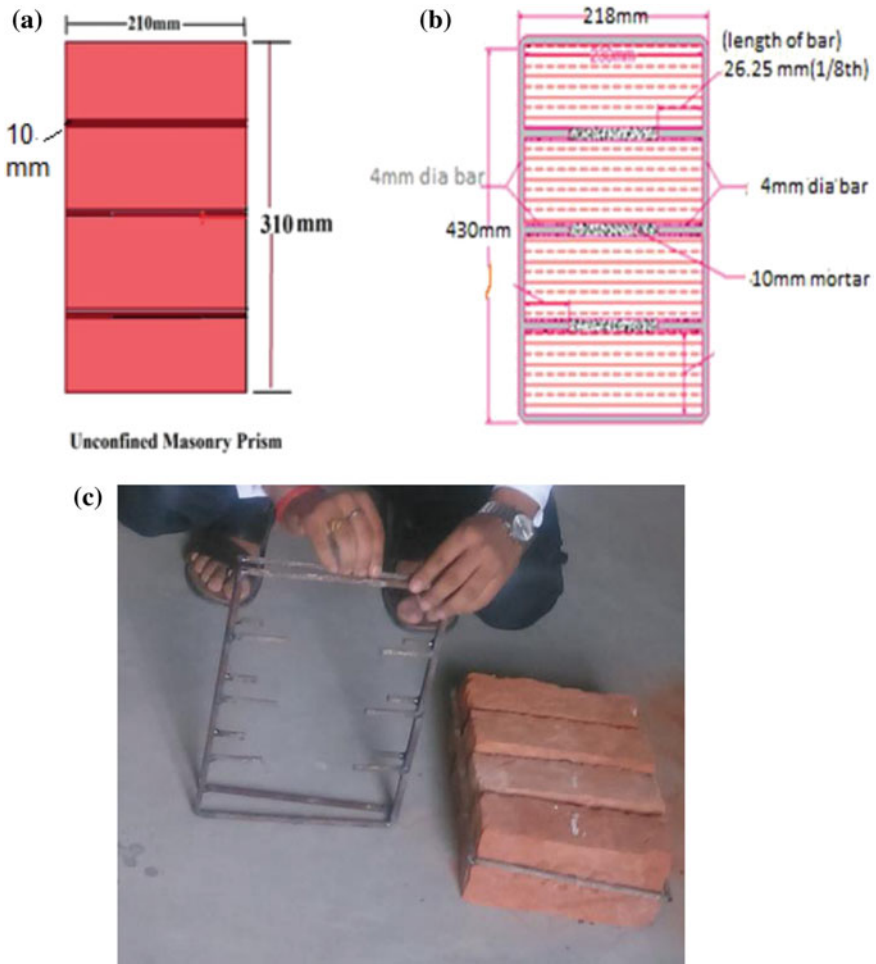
a and b Schematic view of masonry prism. c Pictorial view of reinforcement used
